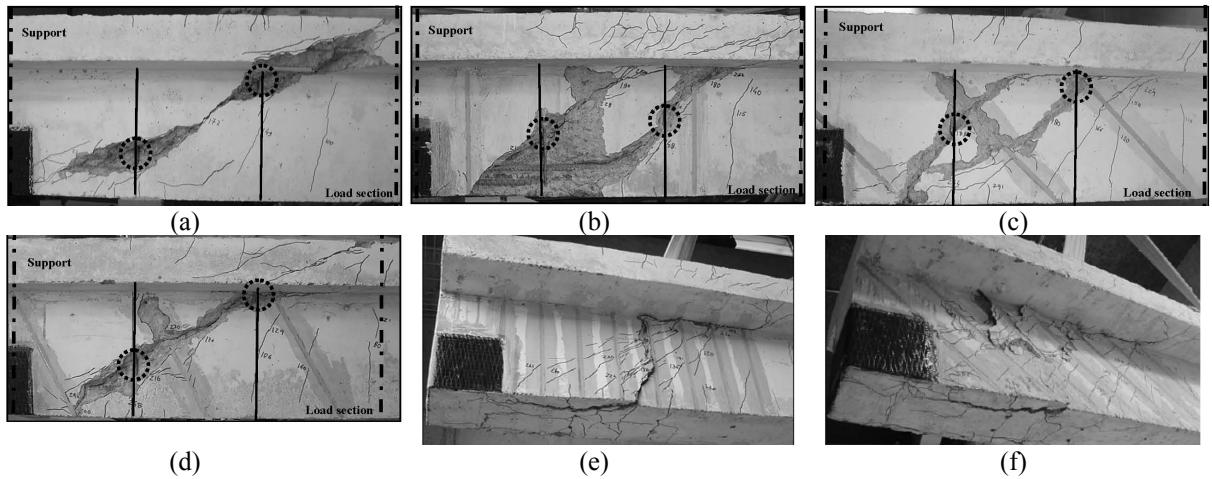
Some details of the failure zones of beams: (a) 2S_R; (b) 2S_3LV; (c) 2S_3LI45; (d) 2S_3LI60; (e) 2S_8LV; (f) 2S_8LI45
